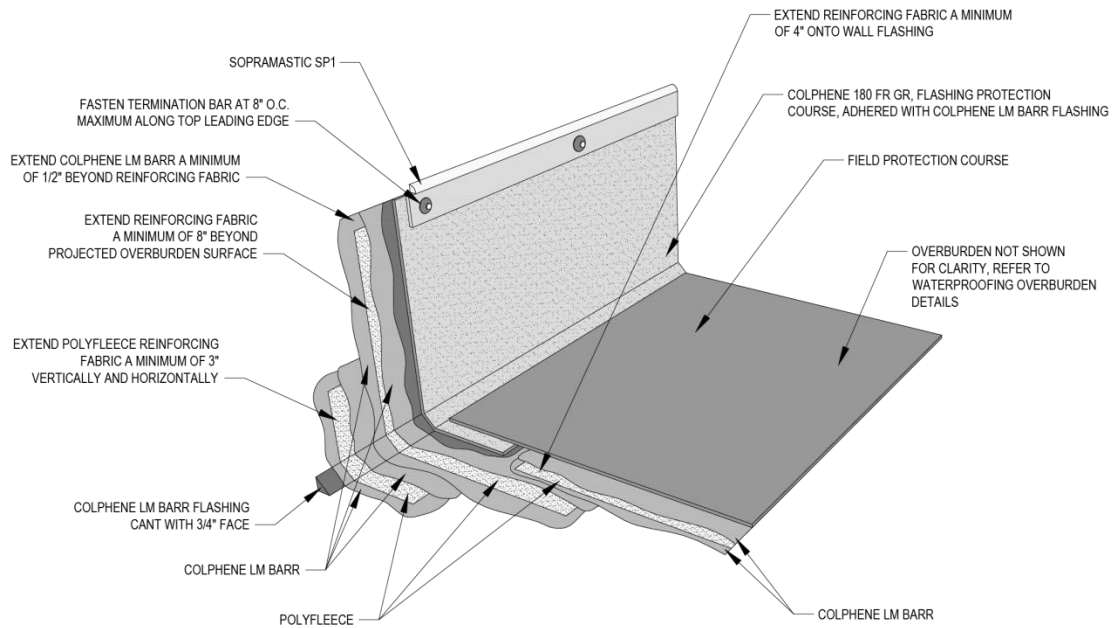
COLPHENE® LM BARR At Wall/Curb
